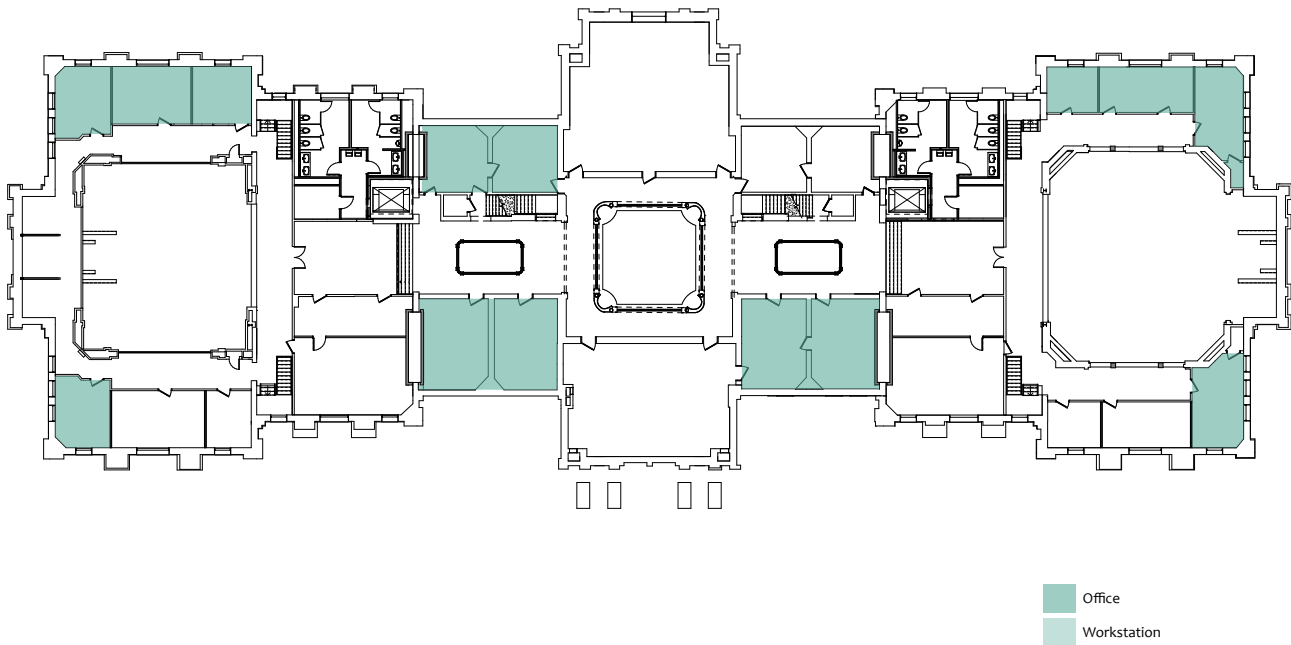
Proposed Office and Workstations - Third Floor [Capitol]
